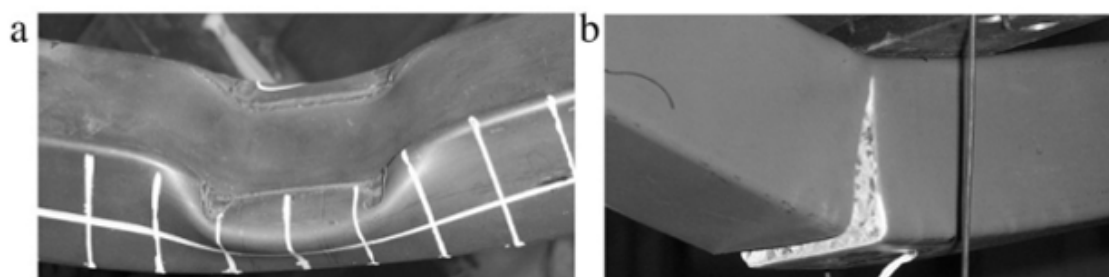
Failure modes at the impact point of loading for specimen 50SHS, where, (a) Local buckling failure mode for hollow steel tube and (b) complete failure mode for filled steel tube by Bambach et al. [63].
